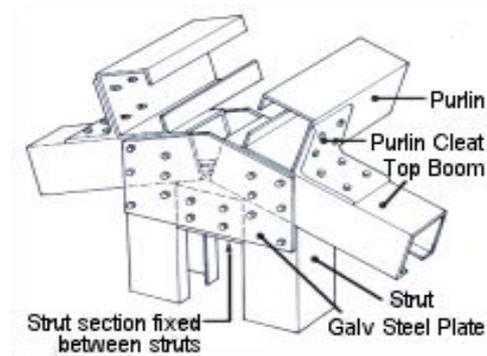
Plate connection system used in construction on the Cover Structure truss.
